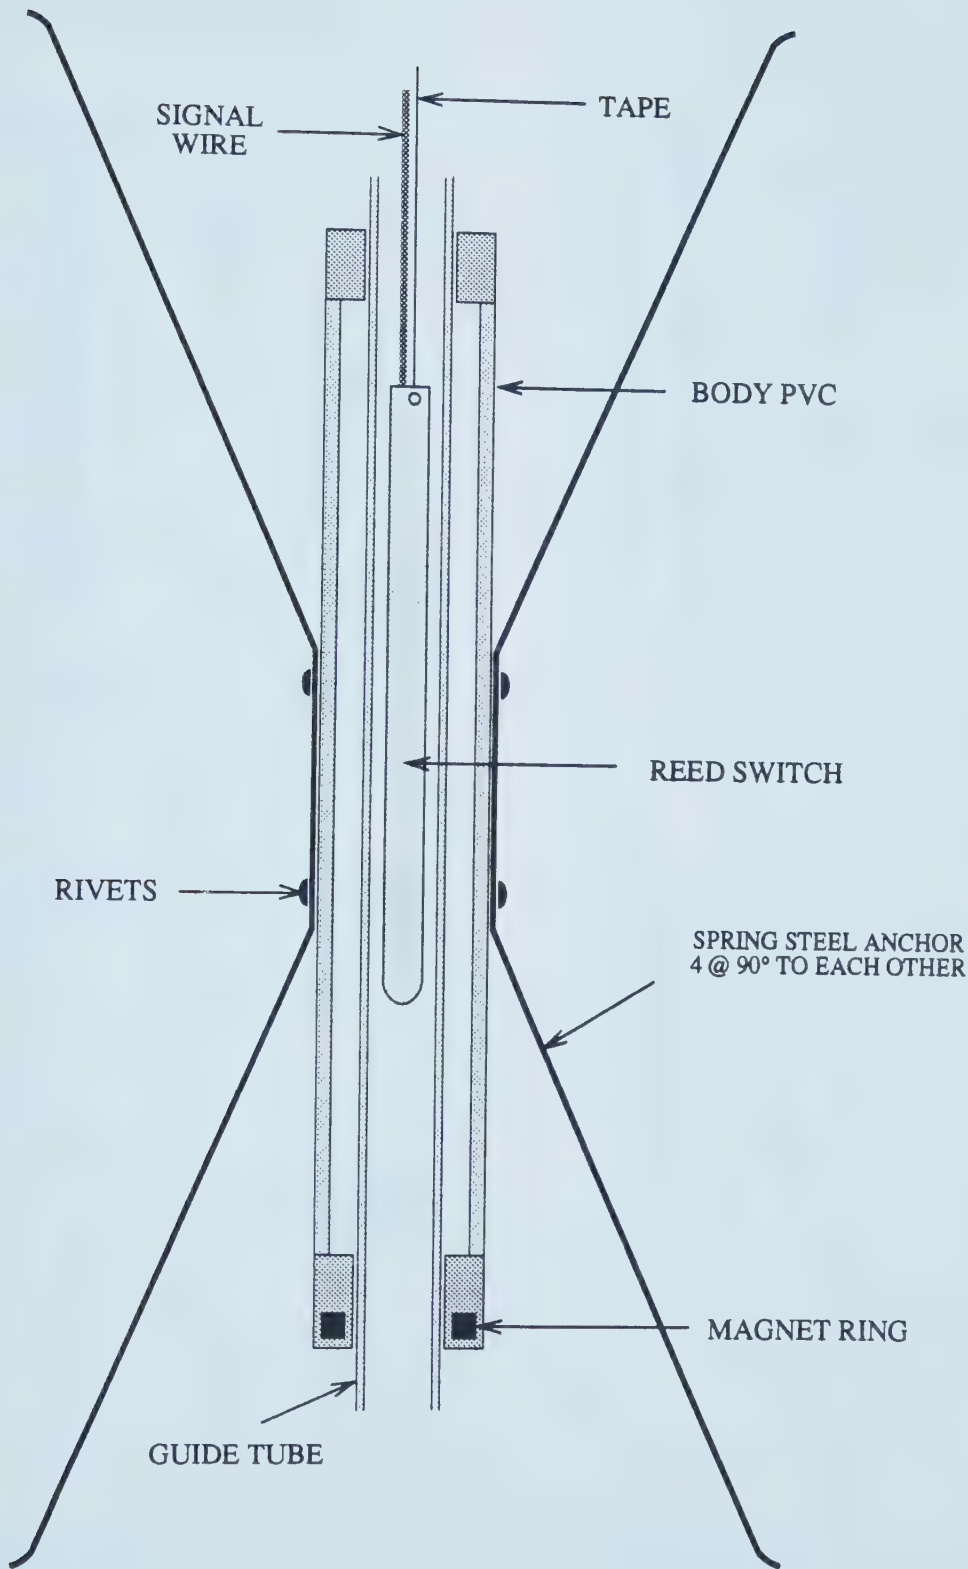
Anchor Assembly Detail of Multipoint Extensometer U. of A. Type
